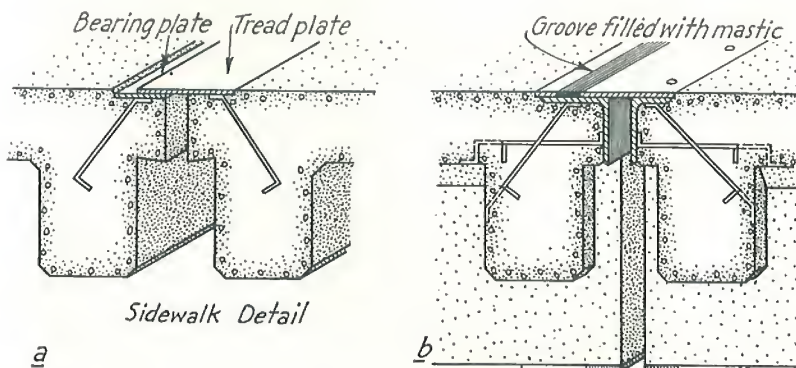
Two types of devices used at expansion joints in concrete decks. Type *a* has been used successfully on sidewalks, while type *b* is preferred on roadways.
